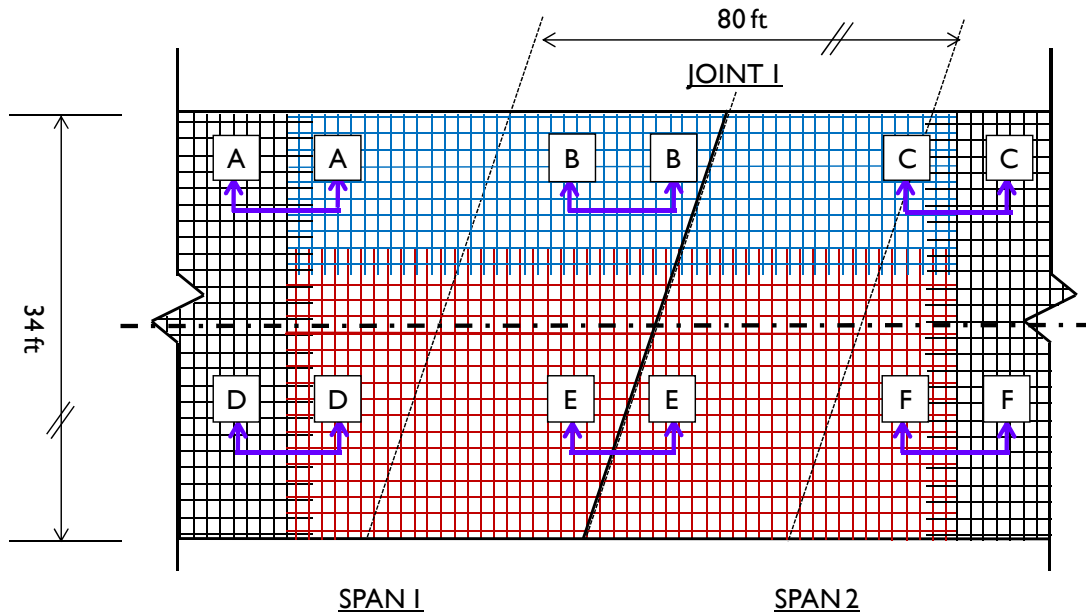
Section of Waco Bridge to be used for Field Study of Top-Mat Reinforcement
